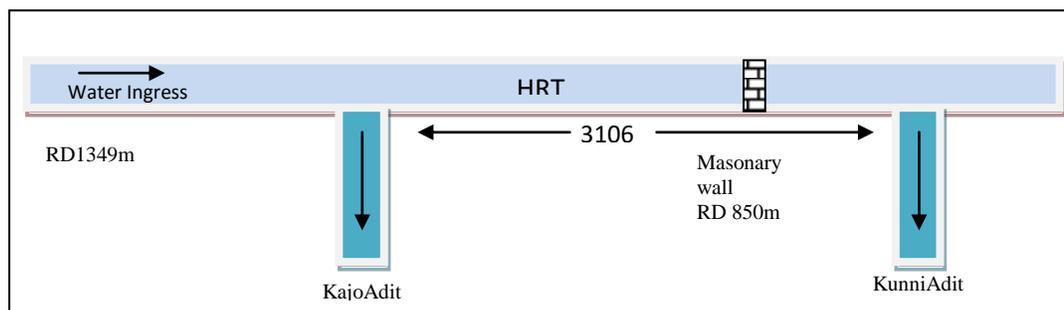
Plan of Dewatering during Flooding in KazoHRT.
